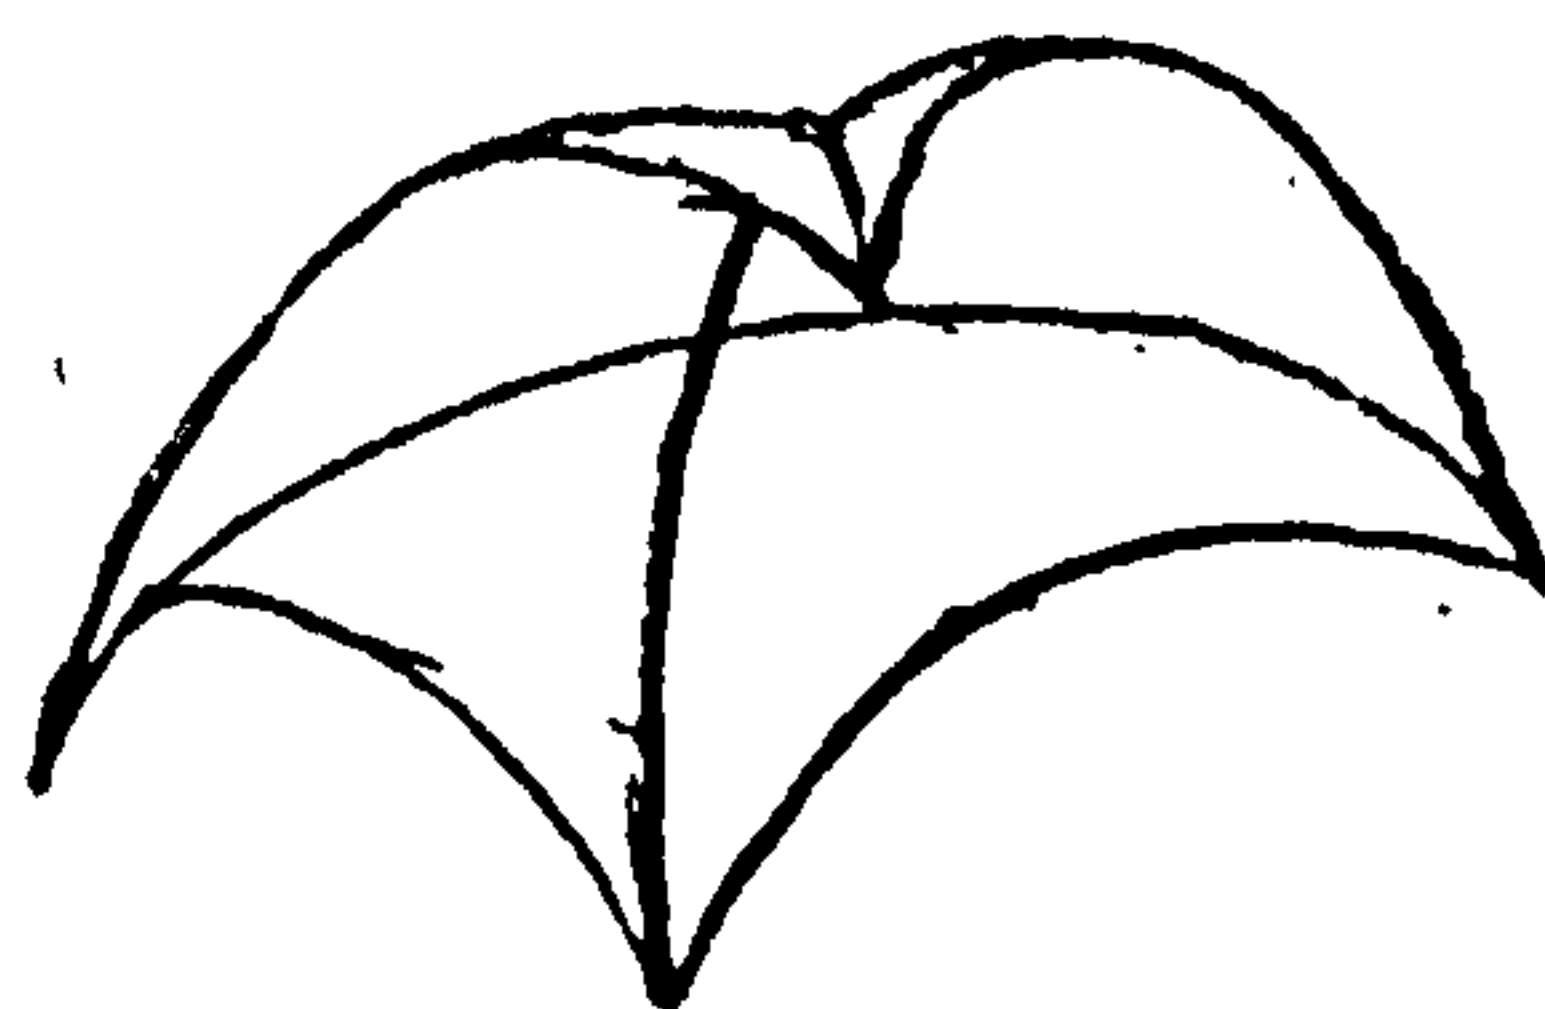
The shops were made up of solid walls and piers linked by arches
